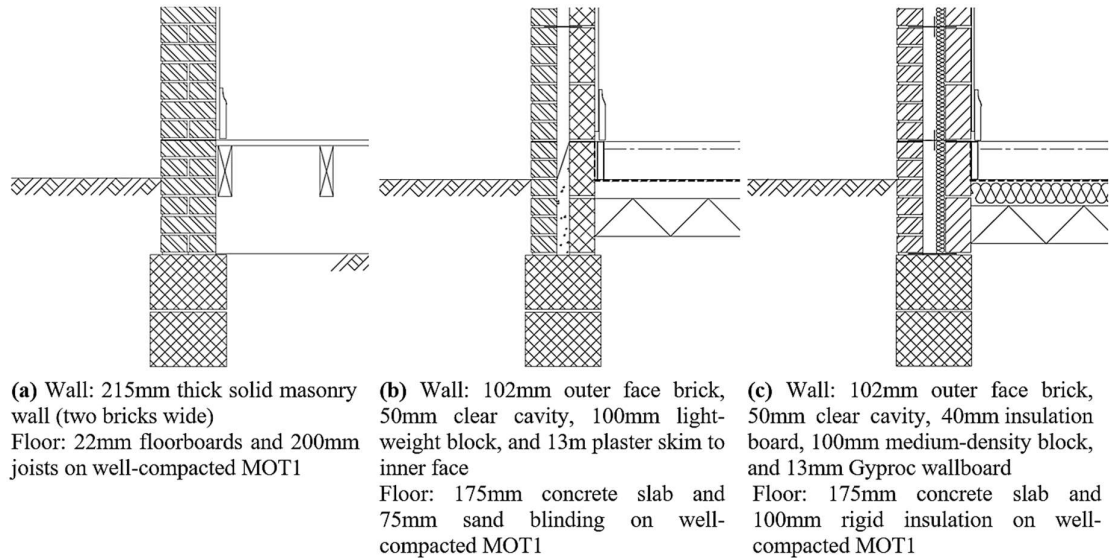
Schematic drawing and characteristics of the walls and flooring in the a) 1930s, b) 1970s, and c) 2010s building types
